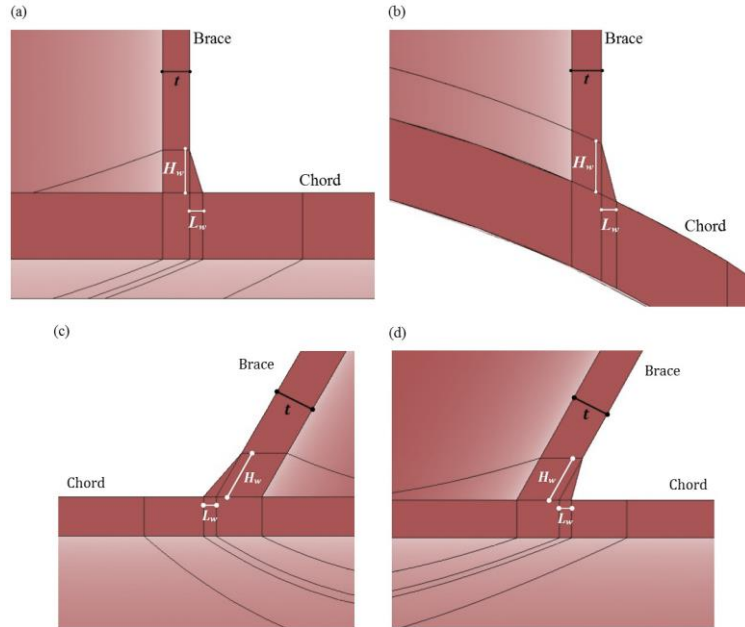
Weld dimensions: (a) Crown position, (a) Saddle position, (c) Toe position and (d) Heel position
